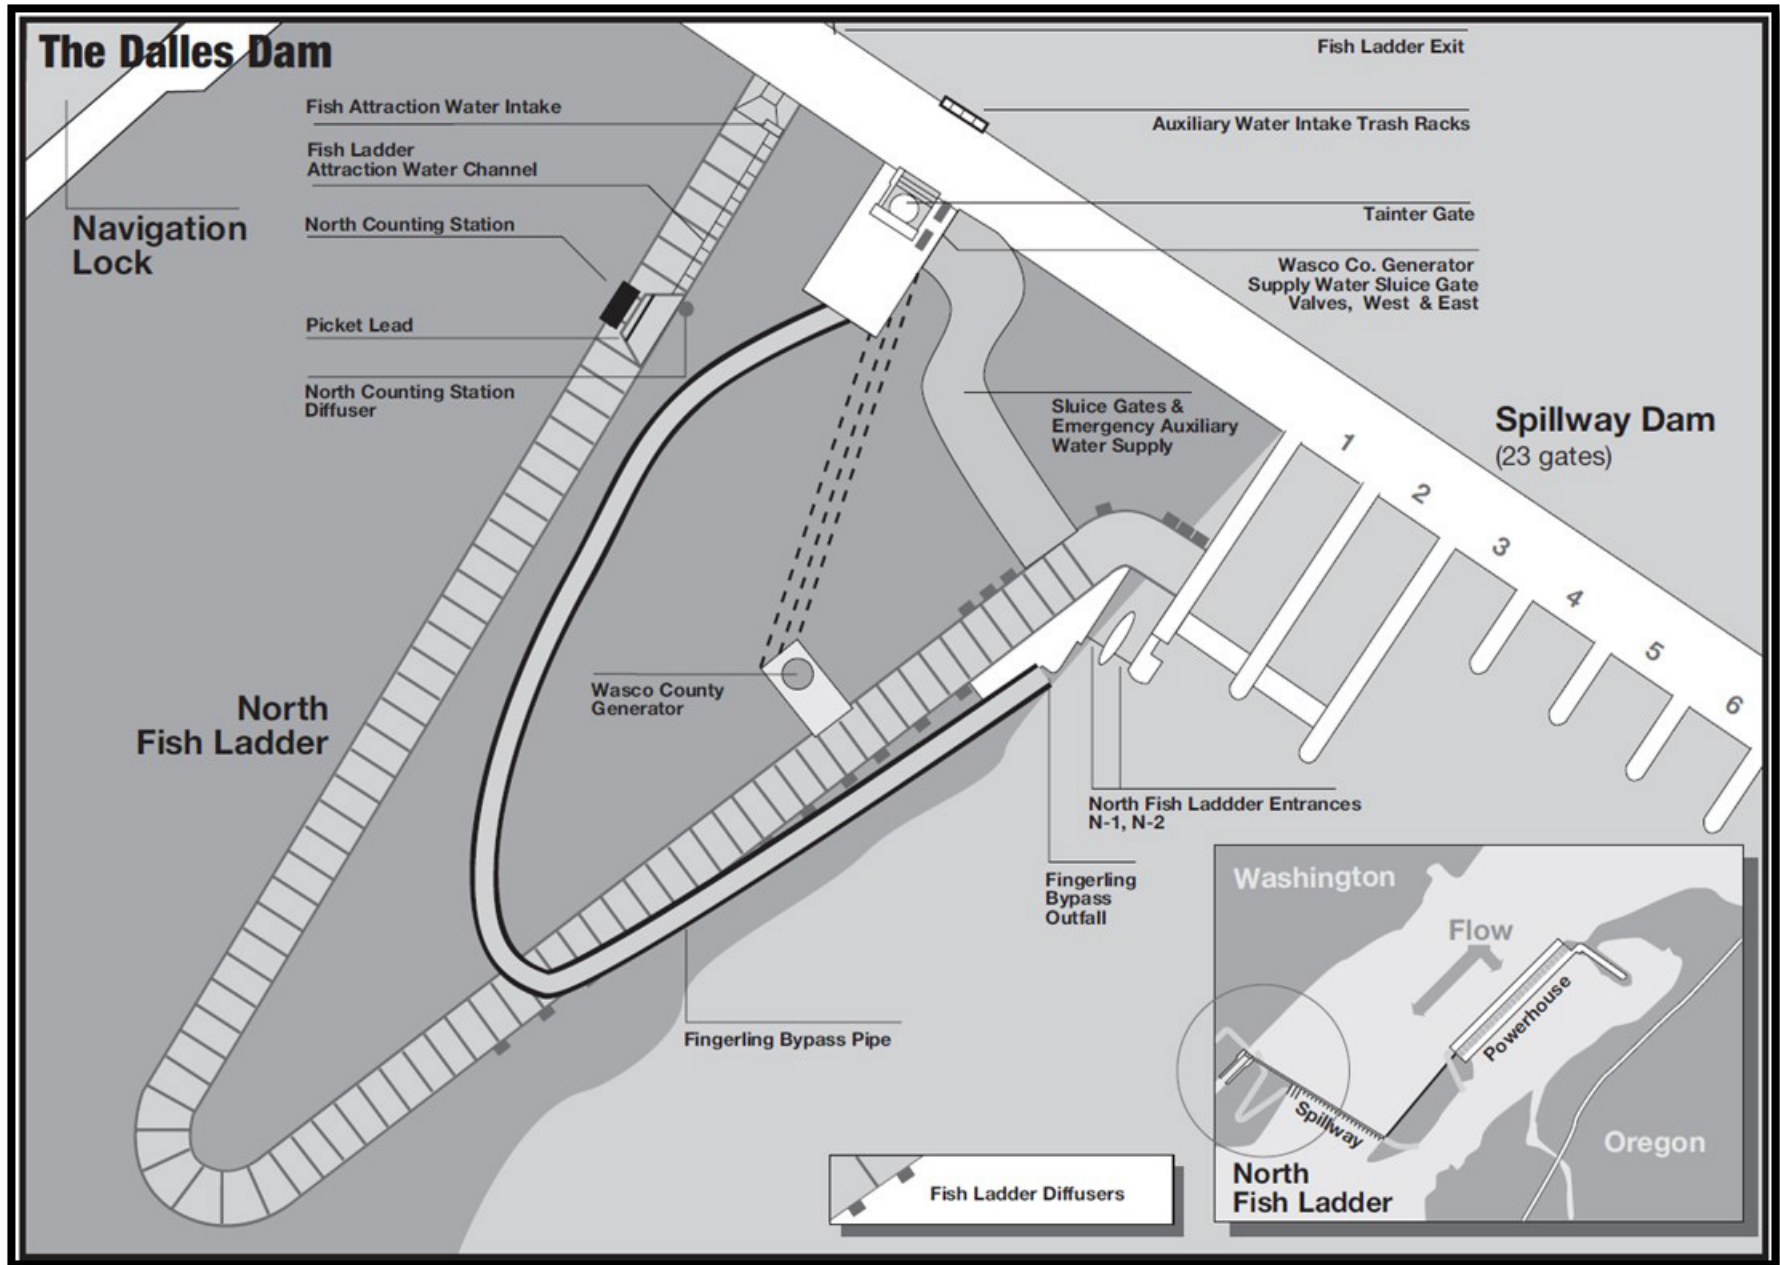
The Dalles Dam North Fish Ladder and Spillway.
